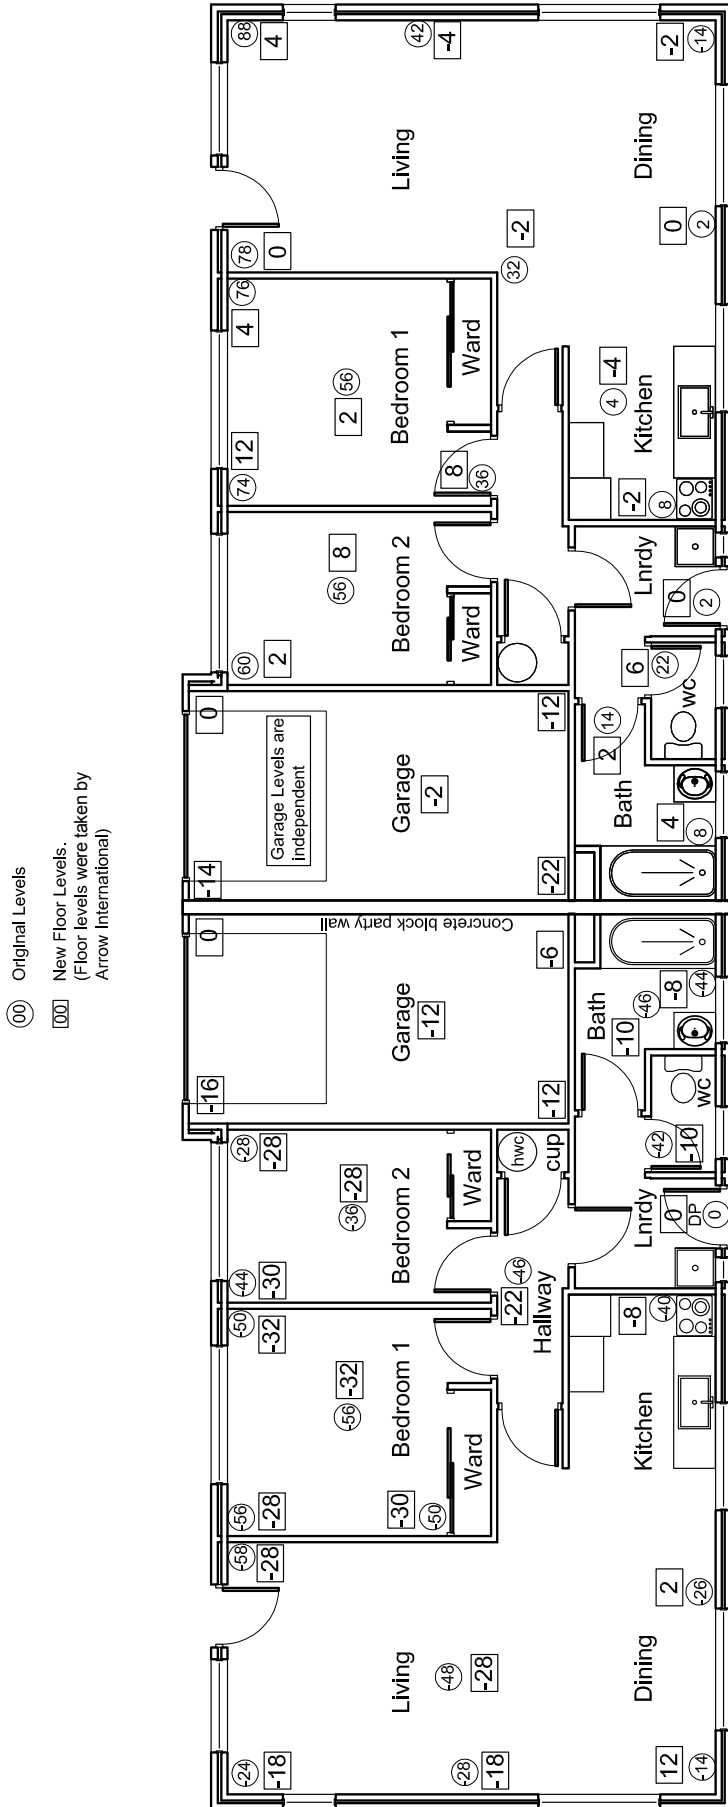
Separation between slab and bottom plate was rectified by mechanically lifting centre of slab at several points. The slab then had the void filled
